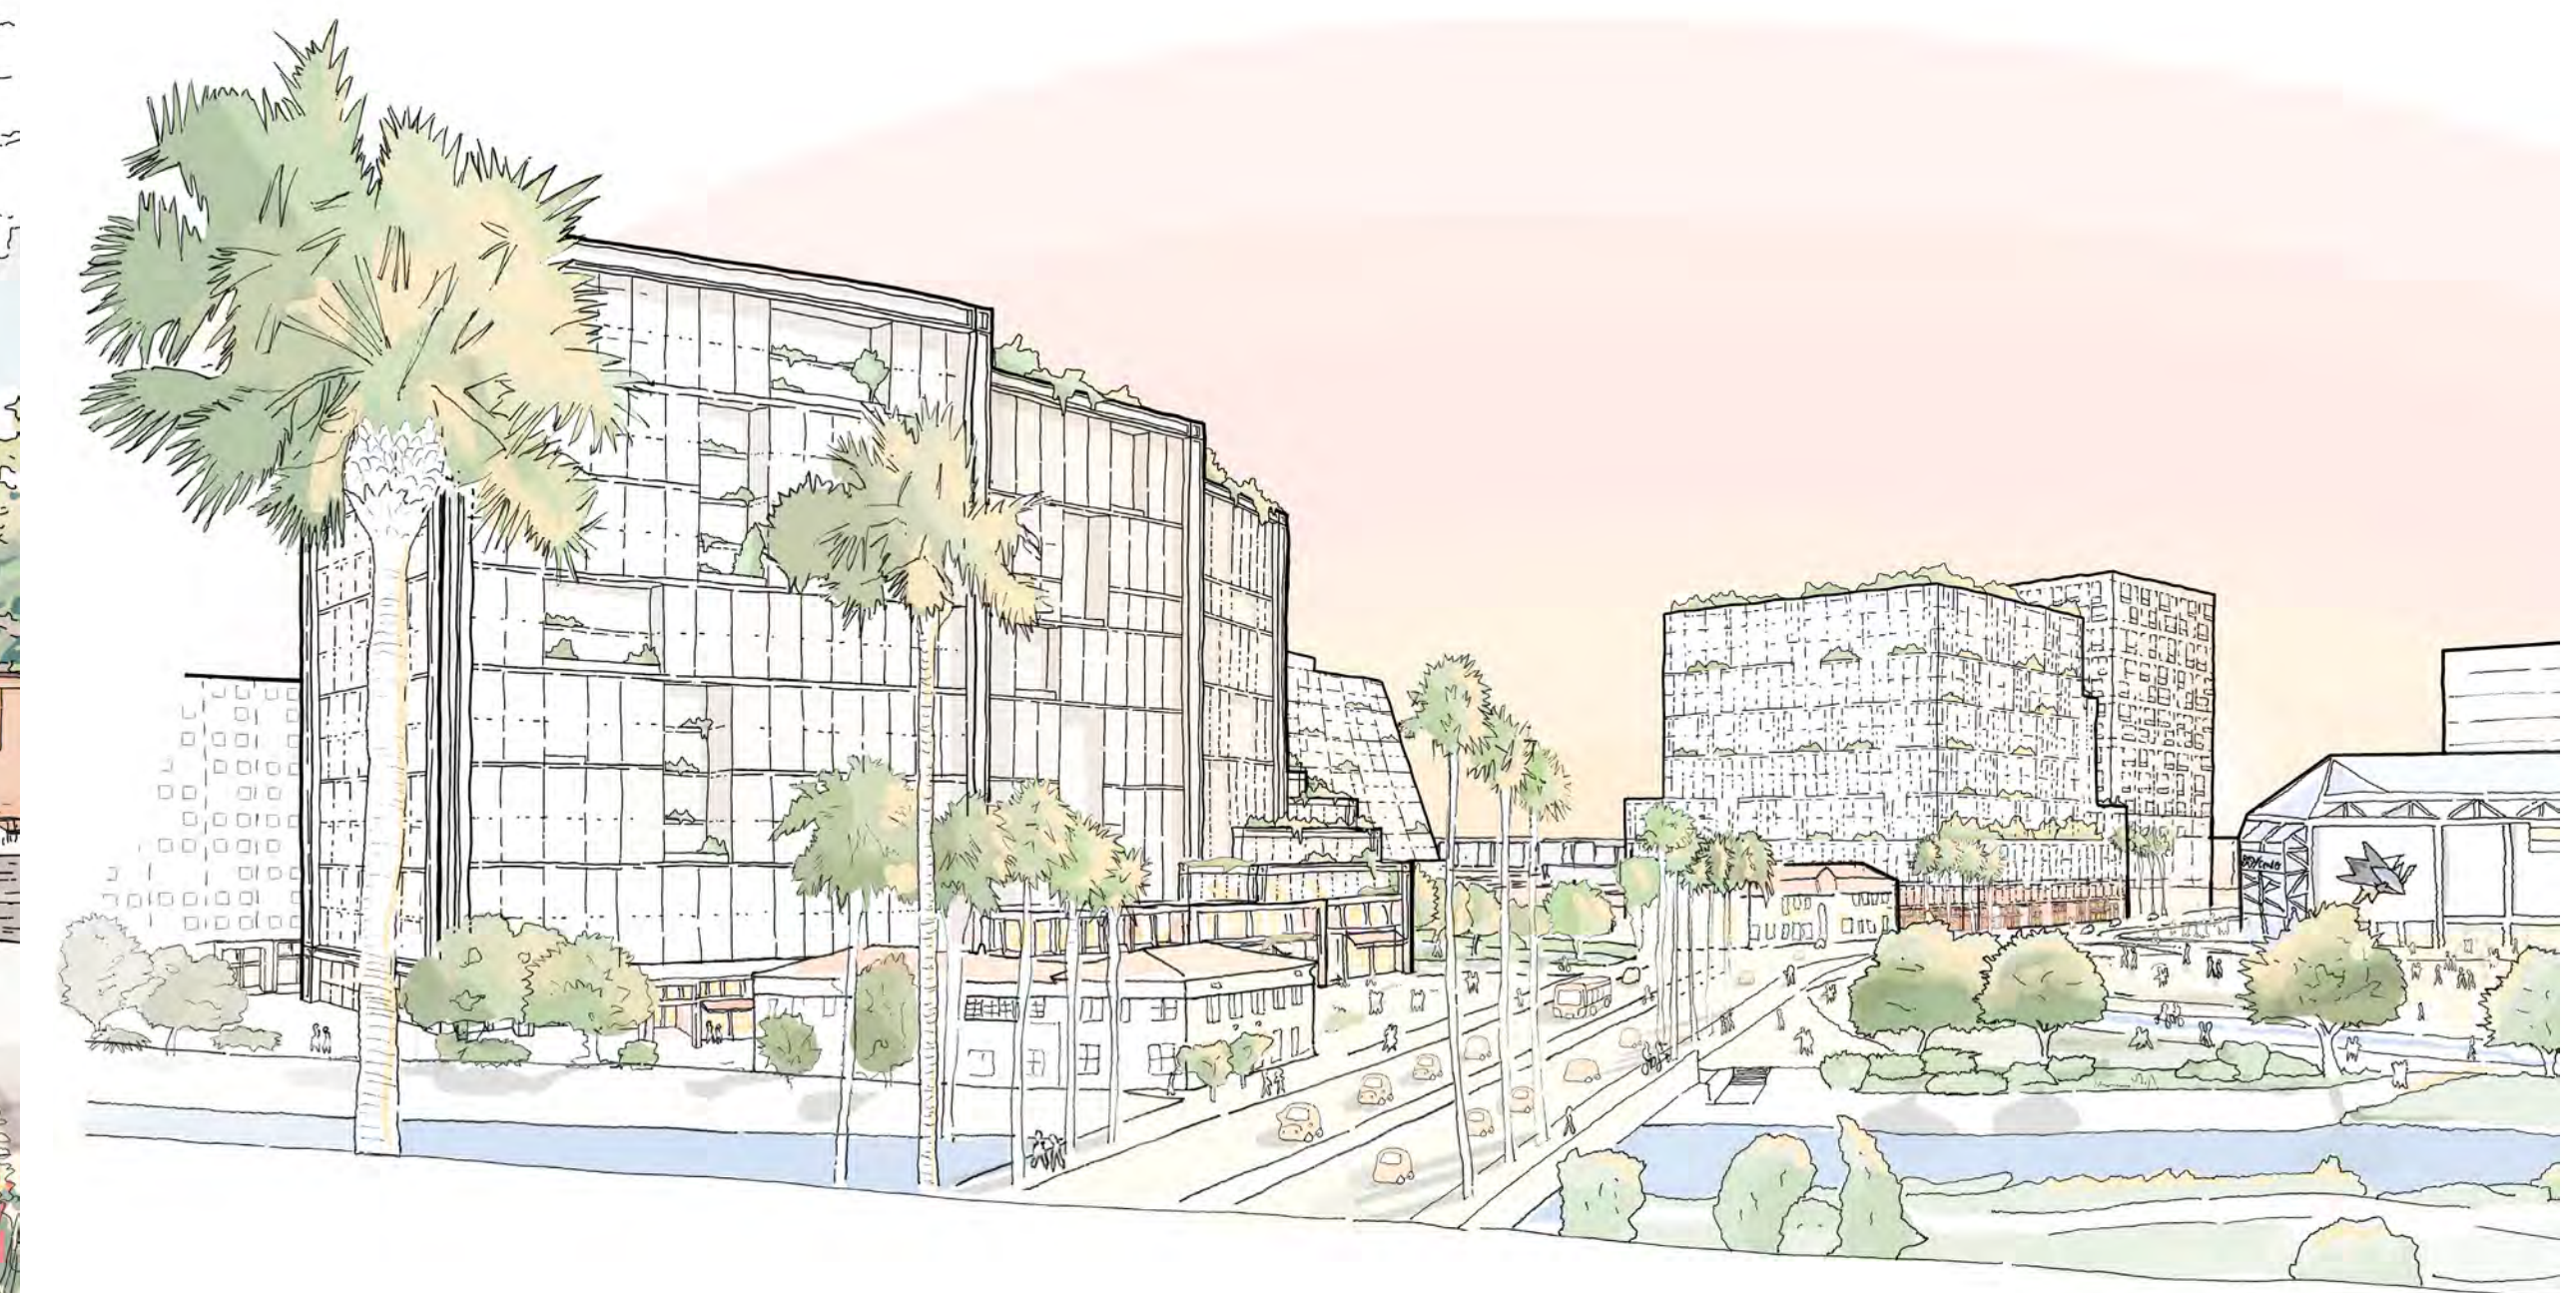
Conceptual Rendering of Proposed Project from State Route 87 Looking Southwest Illustrating Proposed Building Form and Massing
